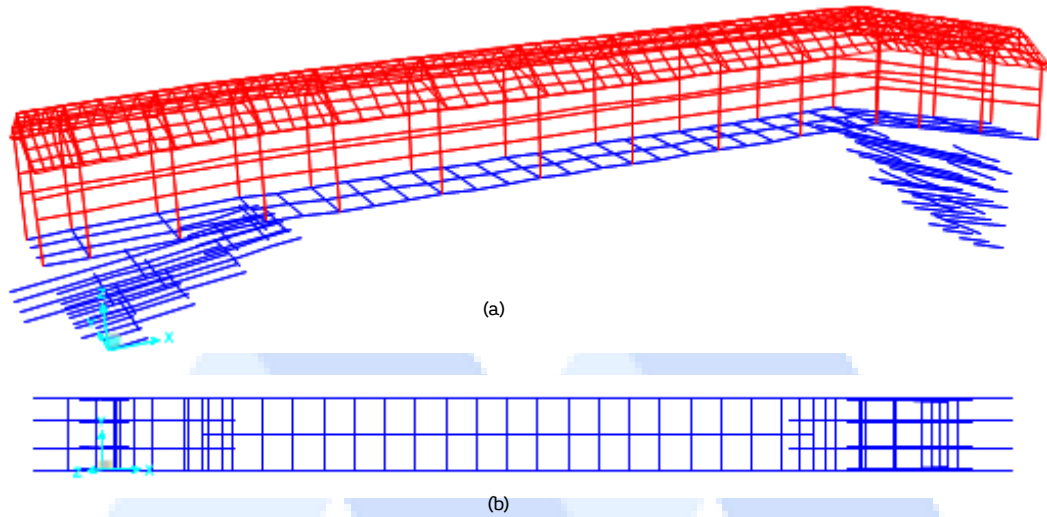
Numerical model of the Buzlupınar Bridge (a- three-dimensional view, b- plan view)
